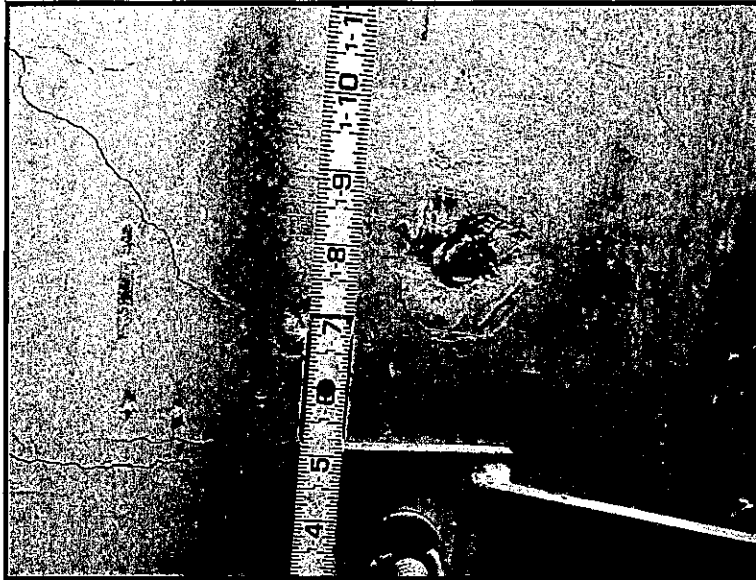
Cut-off Anchor in Rectangular Column at West End of Spandrel
